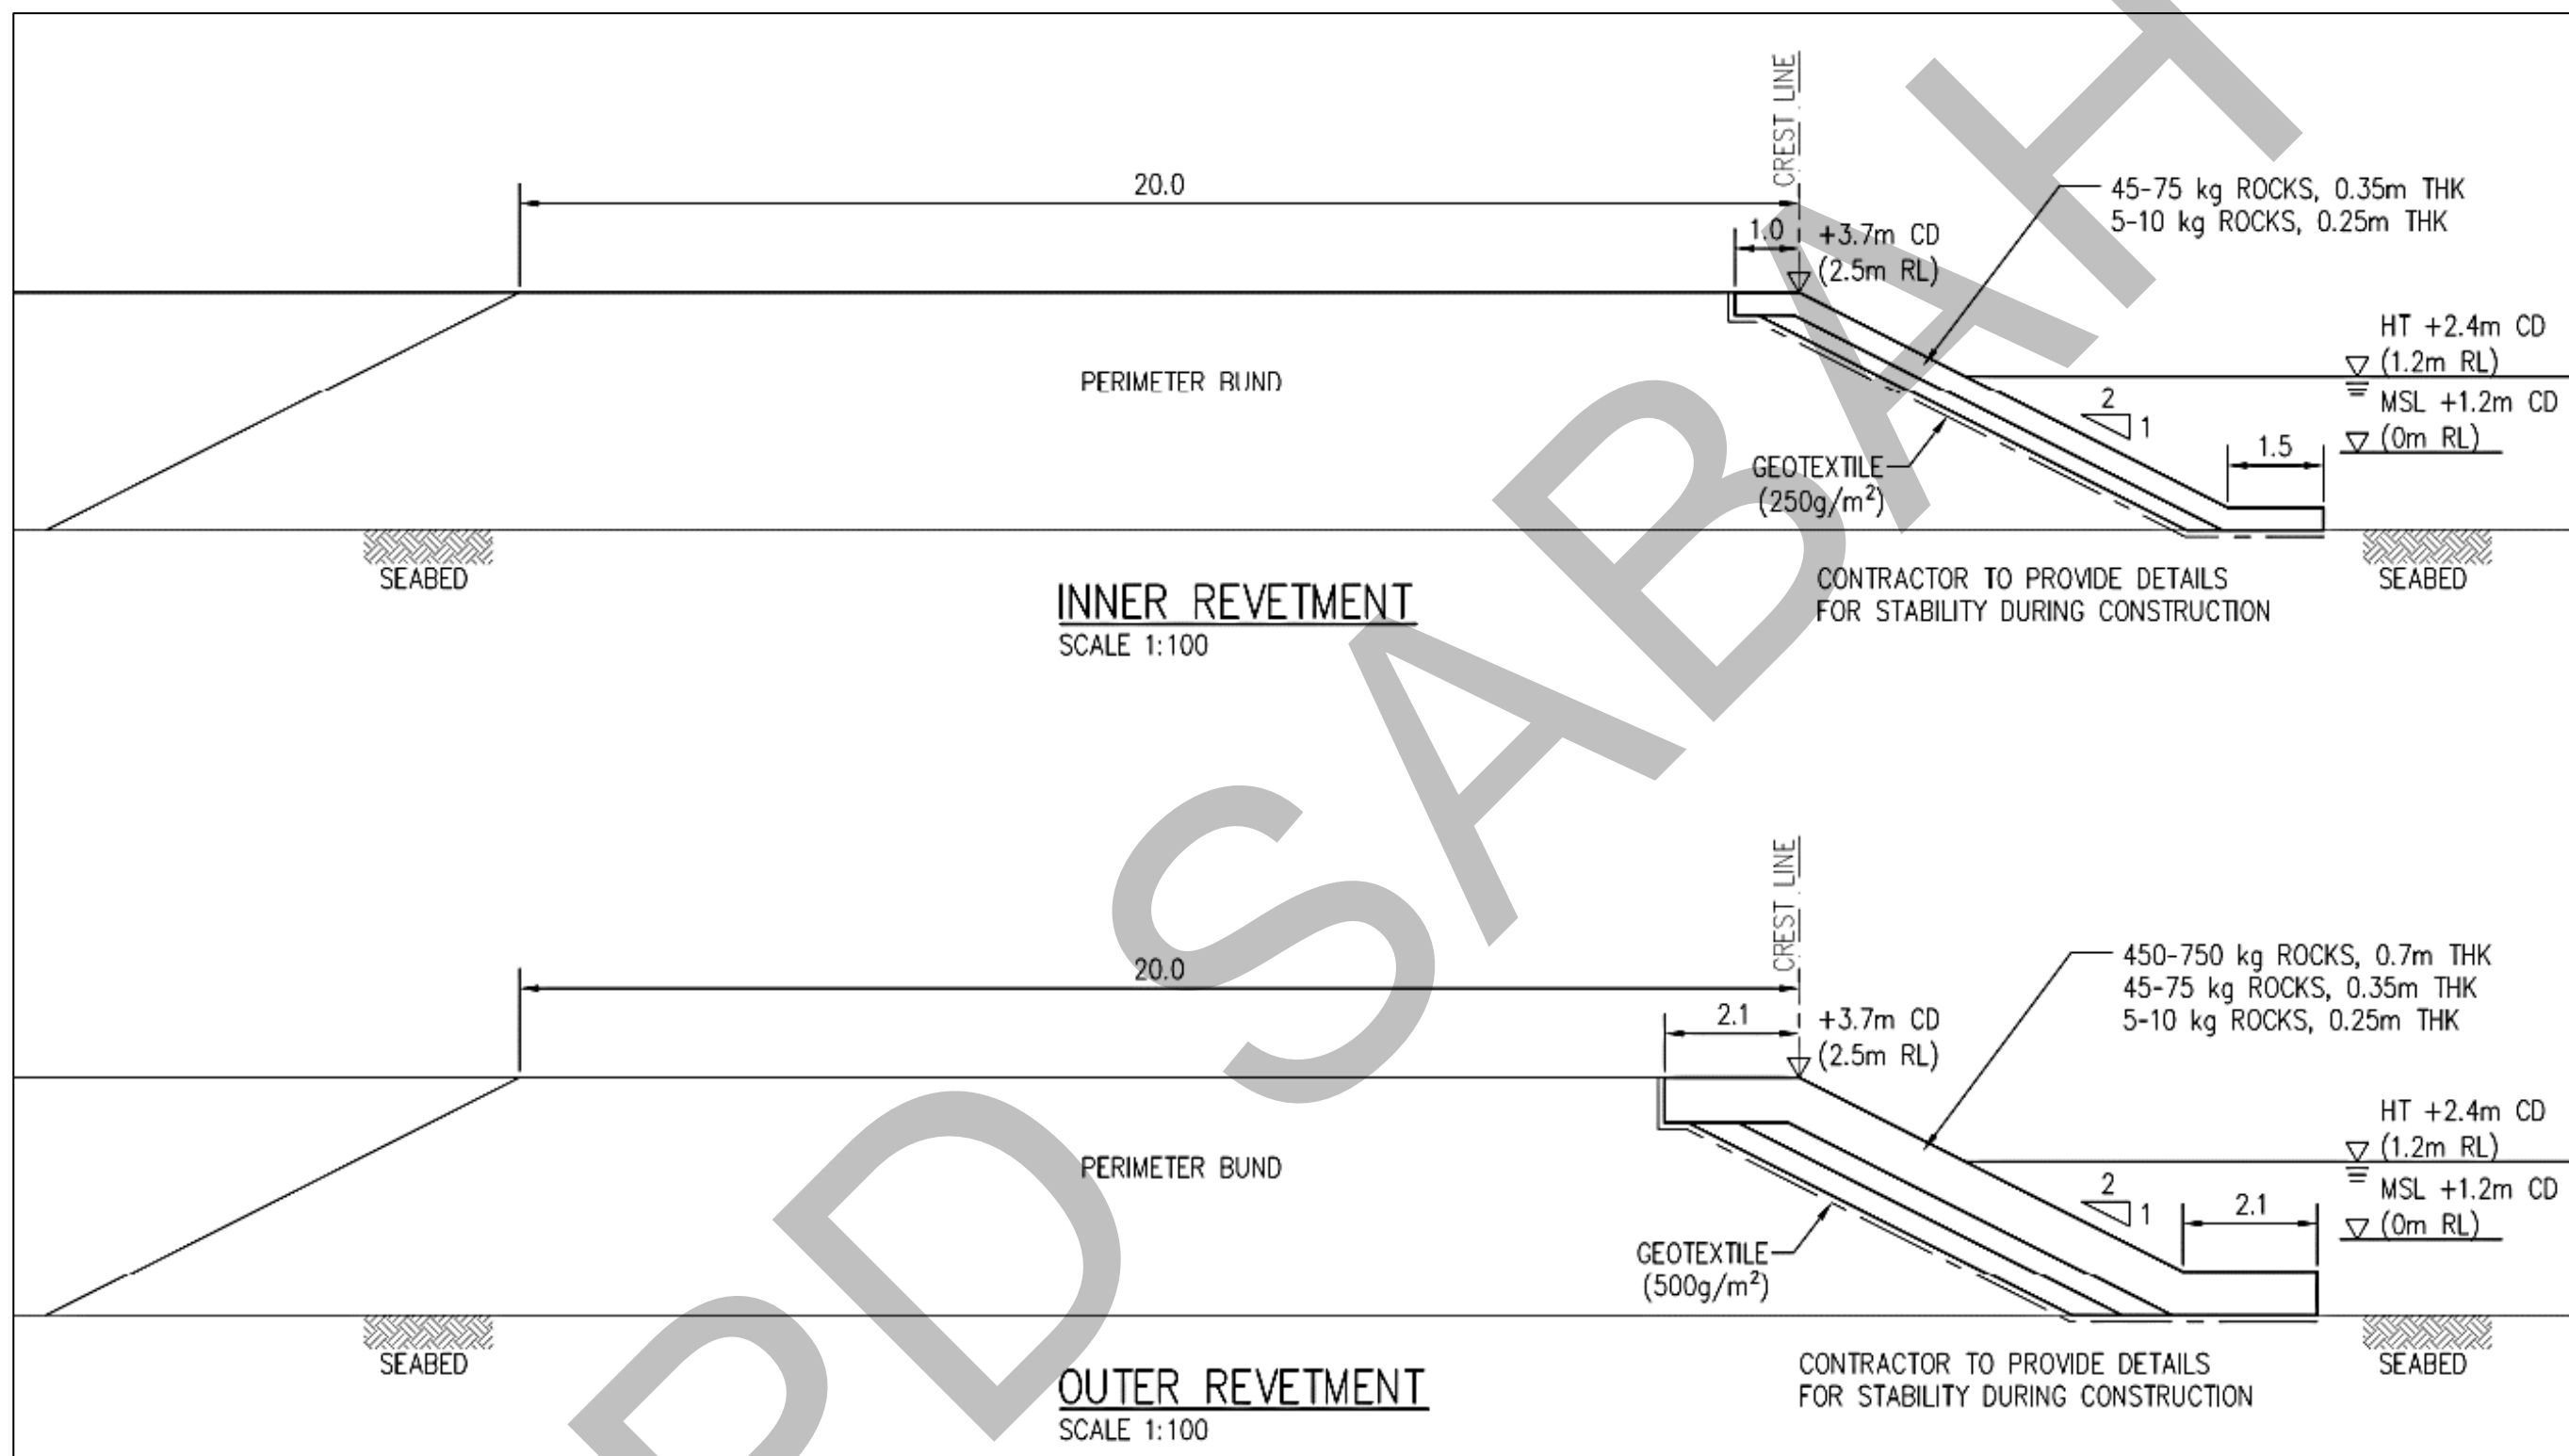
Schematic of the Revetment Cross-Section for the Proposed Development
